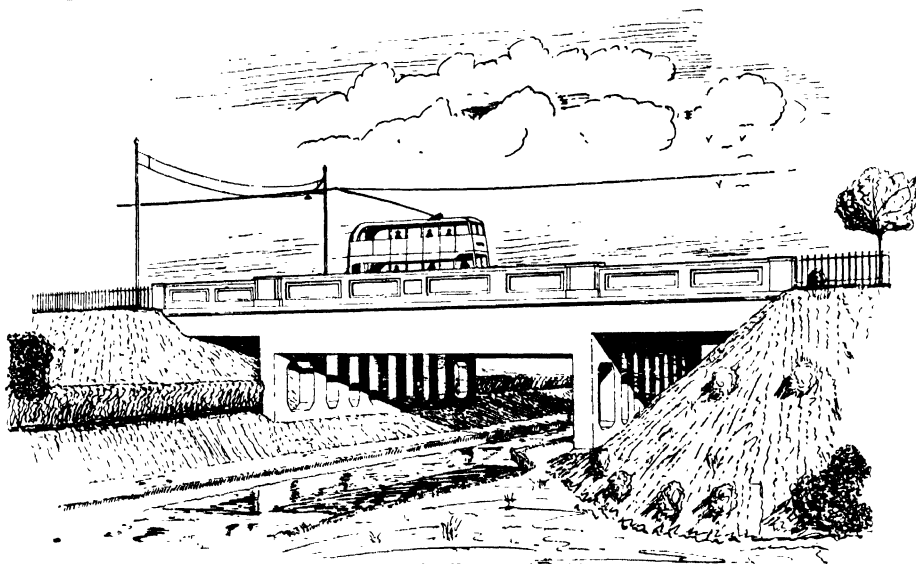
NEWBRIDGE, WOLVERHAMPTON.
